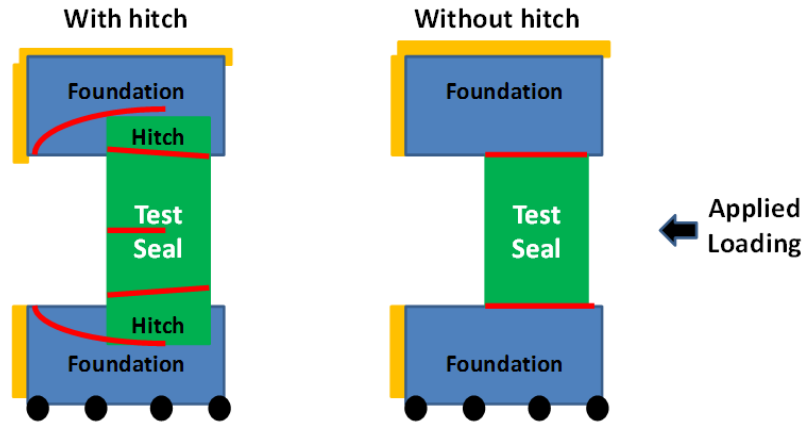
Expected failure modes through seal test specimen – 1) bending or tensile failure through the seal structure (left), 2) shear failure through the foundation (left), 3) shear failure along the seal-foundation interface (right), or 4) shear failure through the seal (left).
